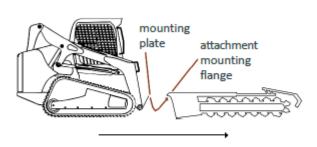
Skid Steer Mounting Plate to Attachment Mounting Flange
